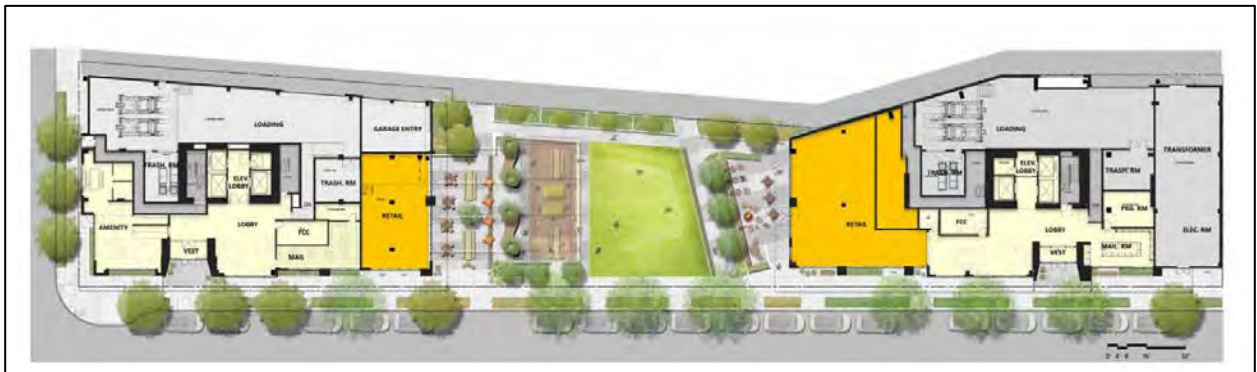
Ground Level Plan, pg. 78 of the DRB Recommendation Packet (North is to the left)
